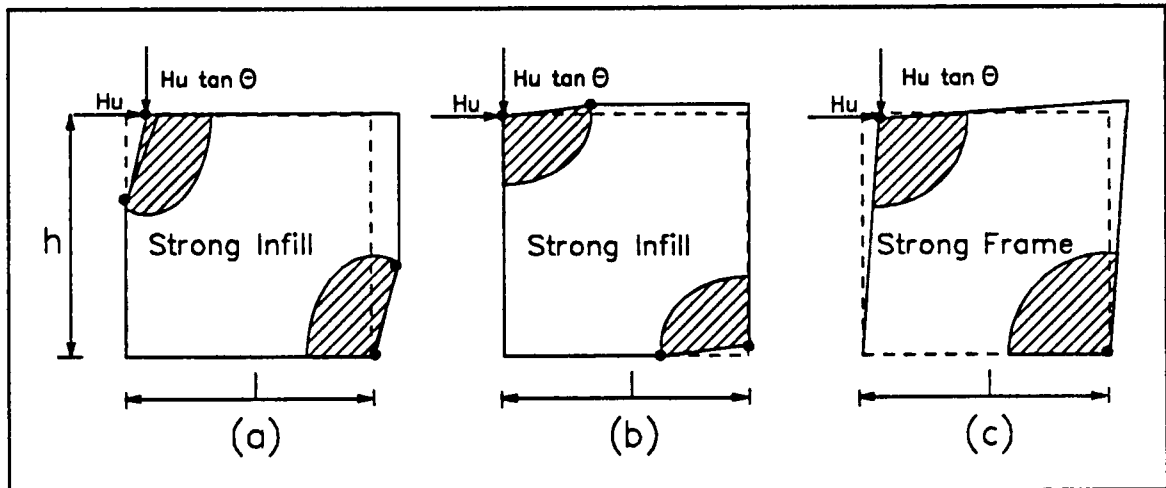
Failure modes of infilled frames: (a) corner crushing with failure in columns (weak columns); (b) corner crushing with failure in beams (weak beams); (c) diagonal crushing (after Liauw and Kwan, 1983).
